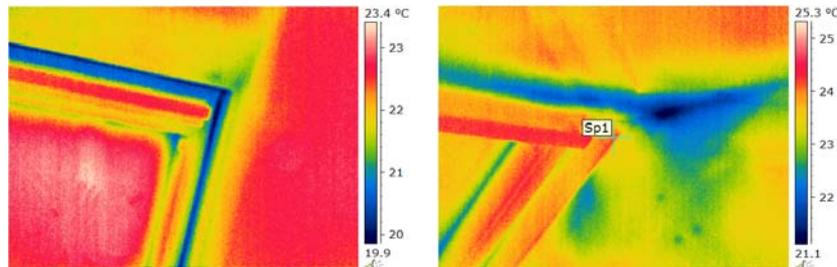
Connection of the roof window panel to the cladding before (left) and during (right) the blower door test
